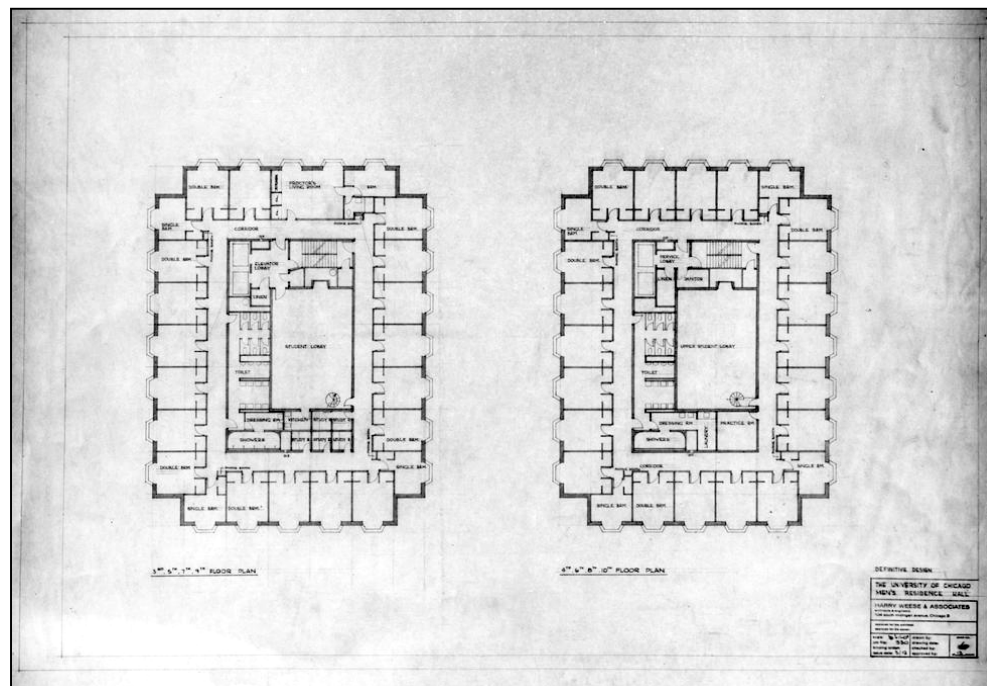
Typical floor plan of Pierce Hall. The social life of residents of E. 55th Street has been removed from the street and concentrated in the interior of an institutional building focused on large, resident-only lounges. (Buildings and Grounds Photographs. UCSC)
